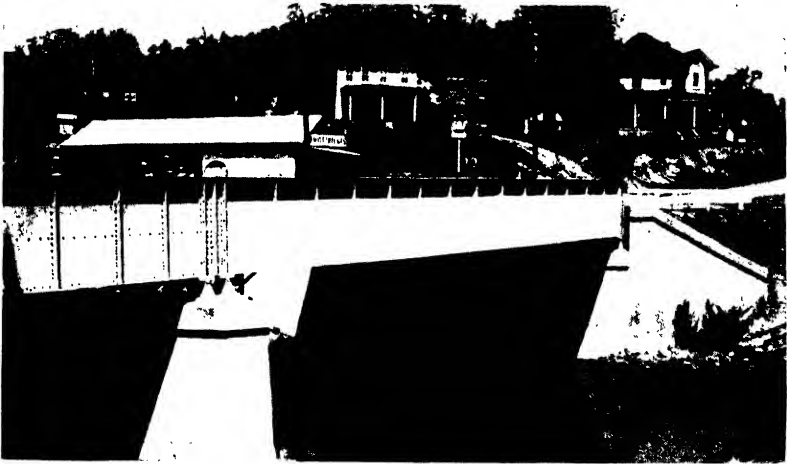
a*.—Bridge with Wing-wall Abutments of Concrete.
